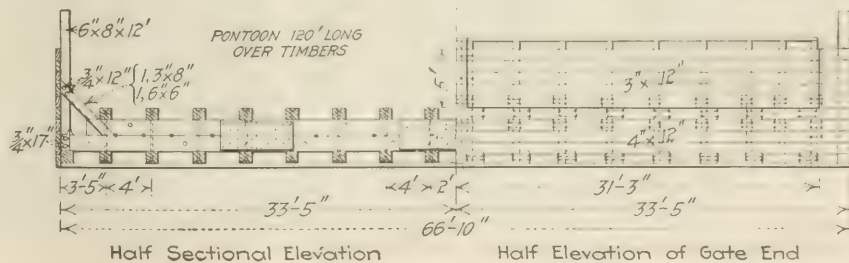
CROSS-SECTION OF PONTON FOR FRAMING AND LAUNCHING THE PIER CAISSONS
